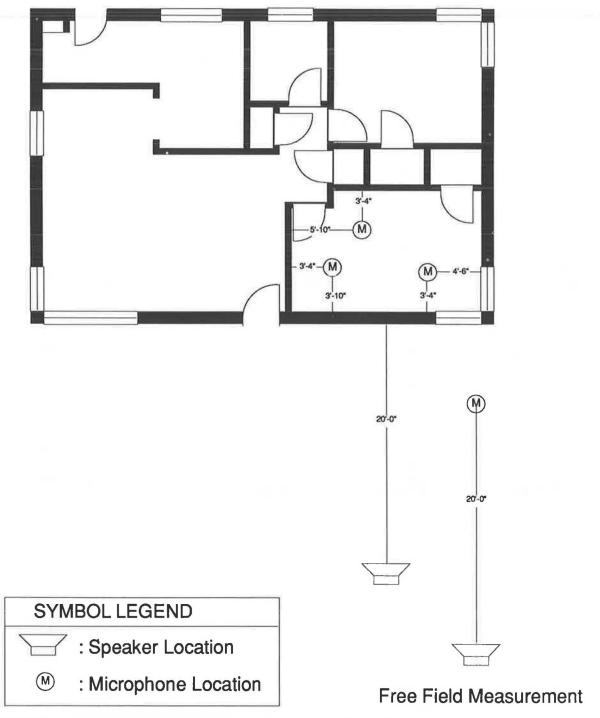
Floor plan of the Denver sample home indicating acoustical test locations.
